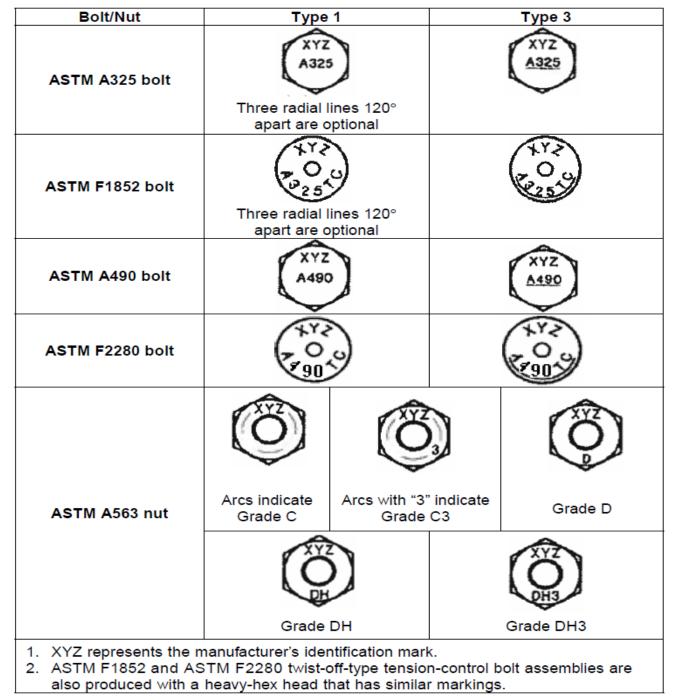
Required marks for acceptable bolt and nut assemblies.
